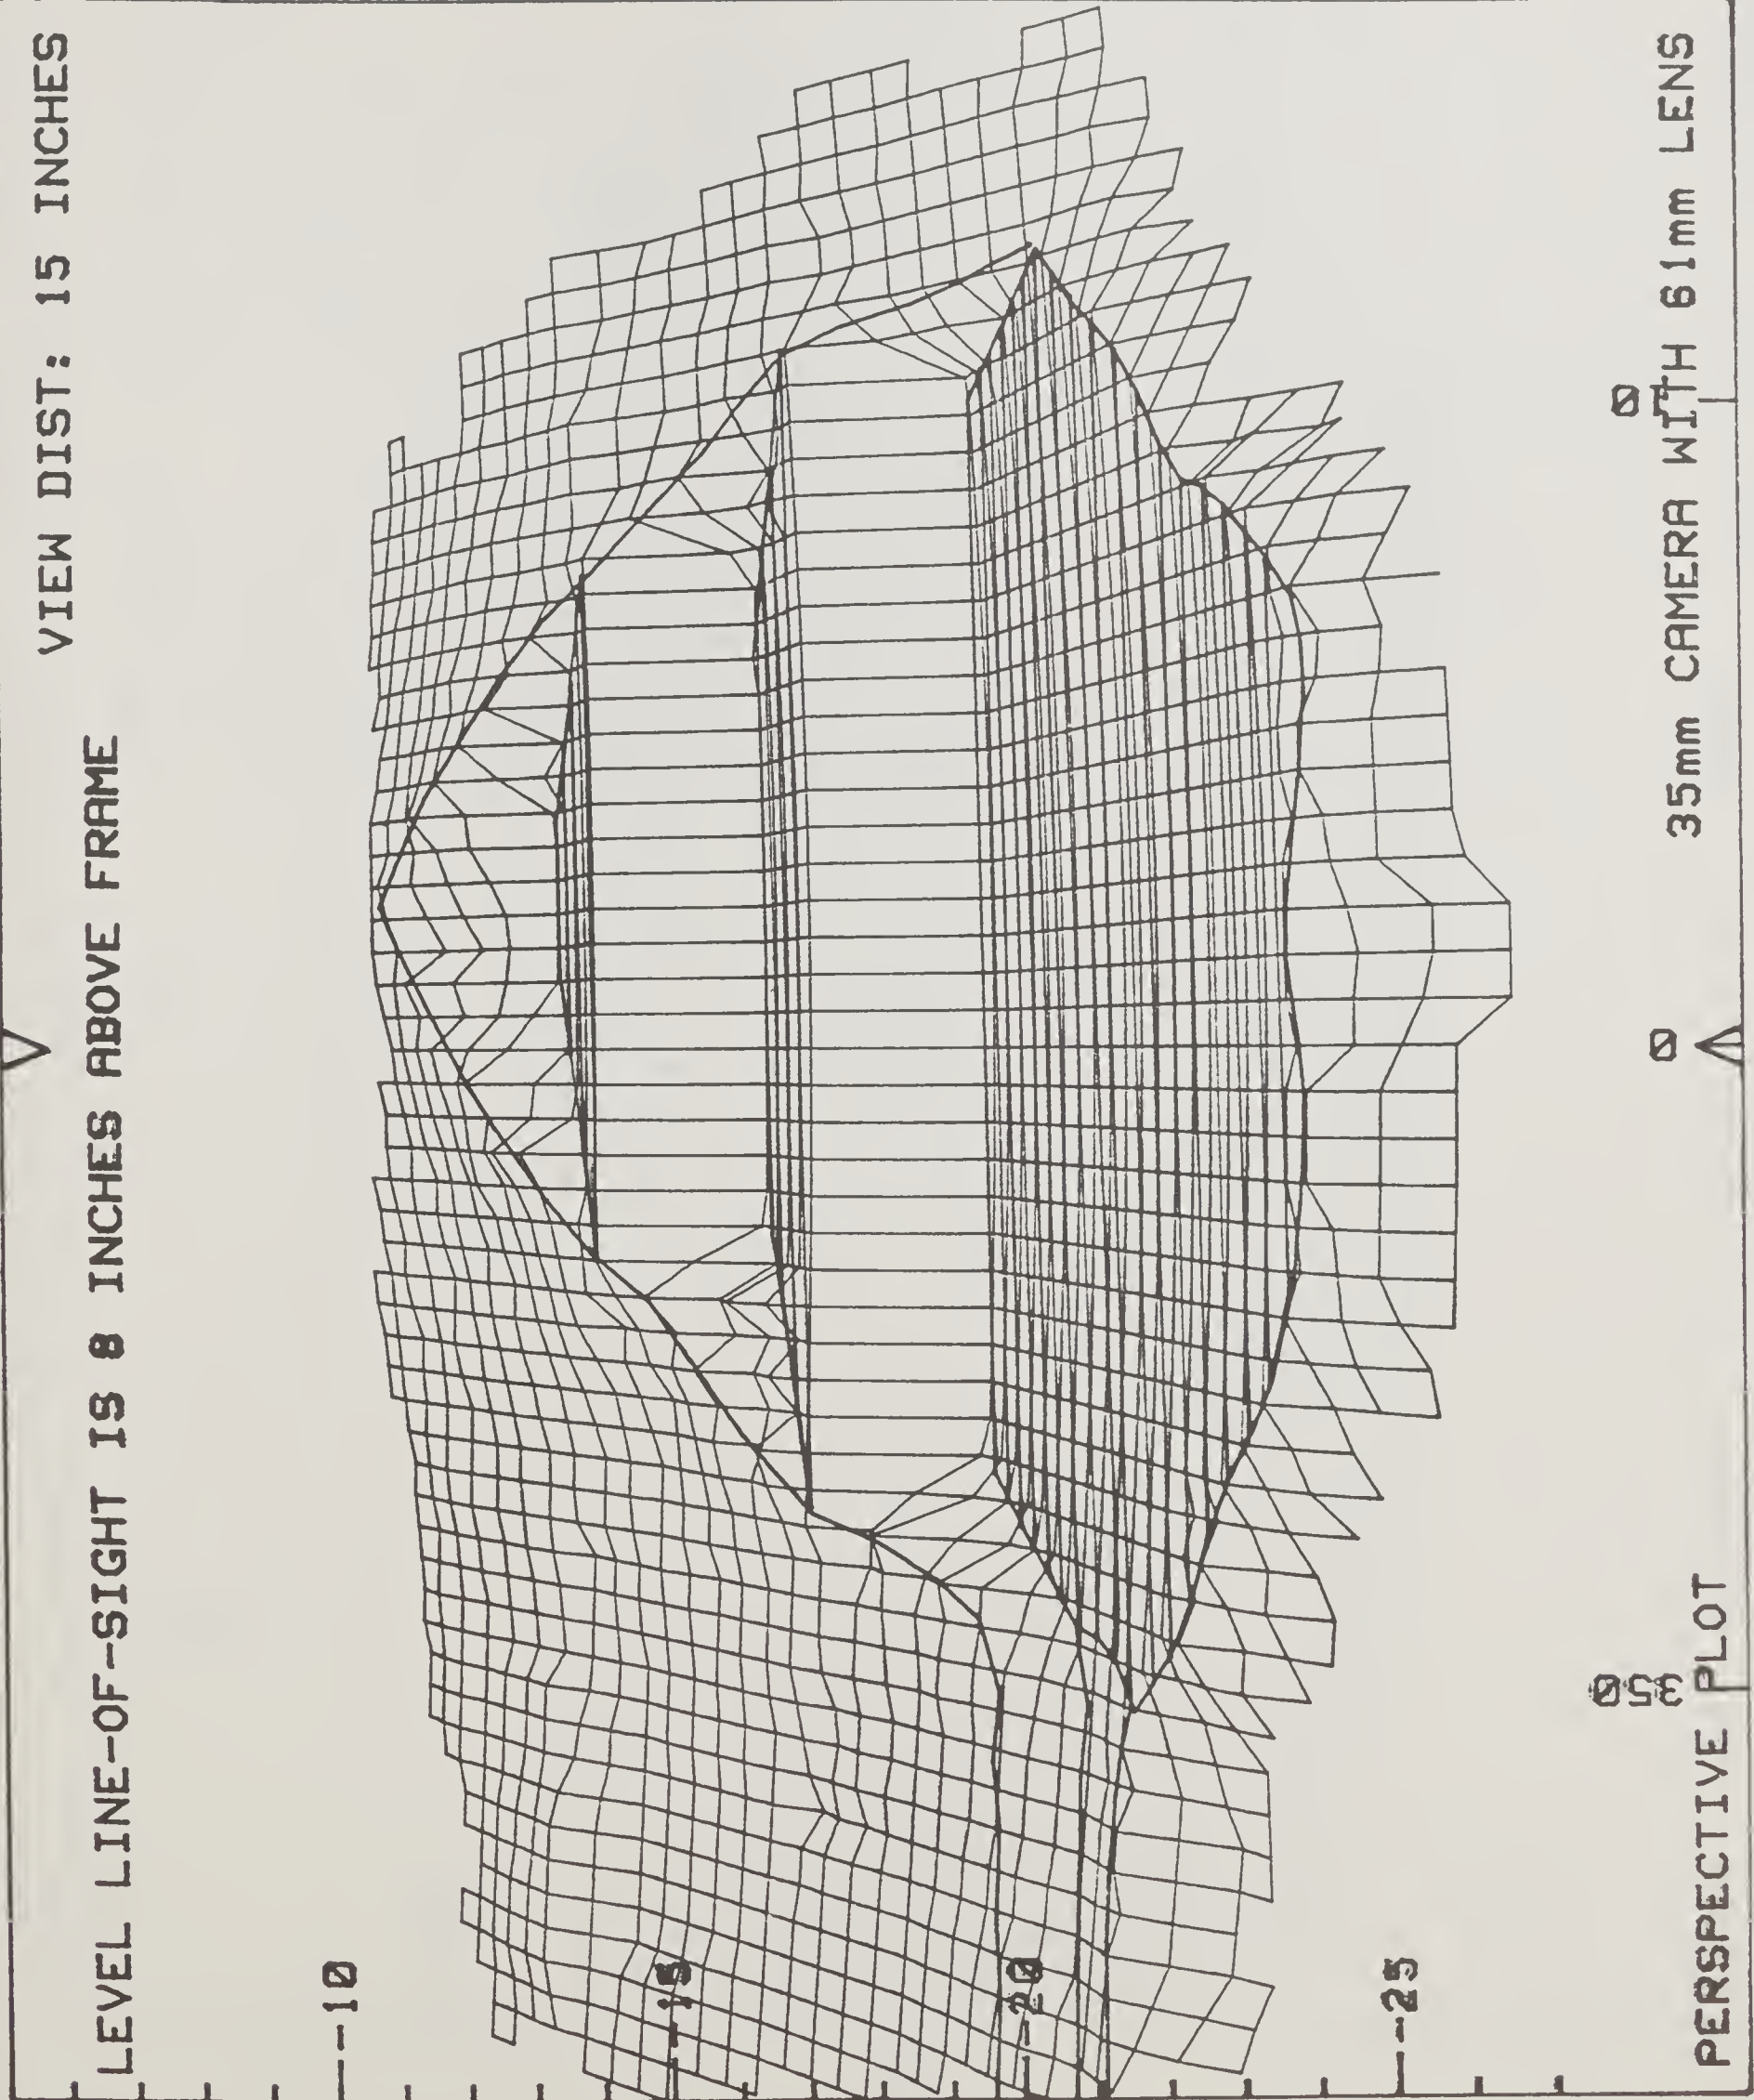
The rock pit has been excavated to its maximum extent. Two benches are apparent, above the main pit floor.
